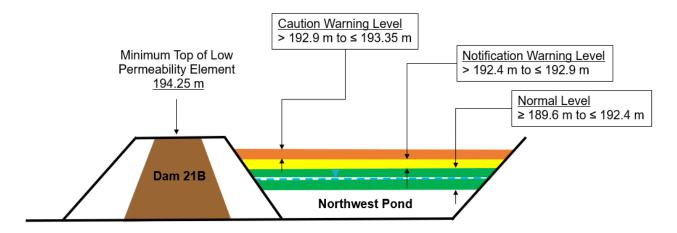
Water and Infrastructure Elevations for Northwest Pond (not to scale)
